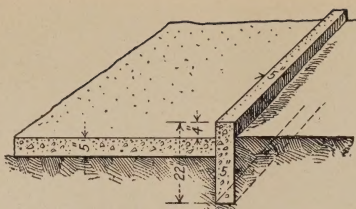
Diagram showing construction of feeding floor. At the right the apron or curb wall is to prevent hogs from rooting under the floor.
